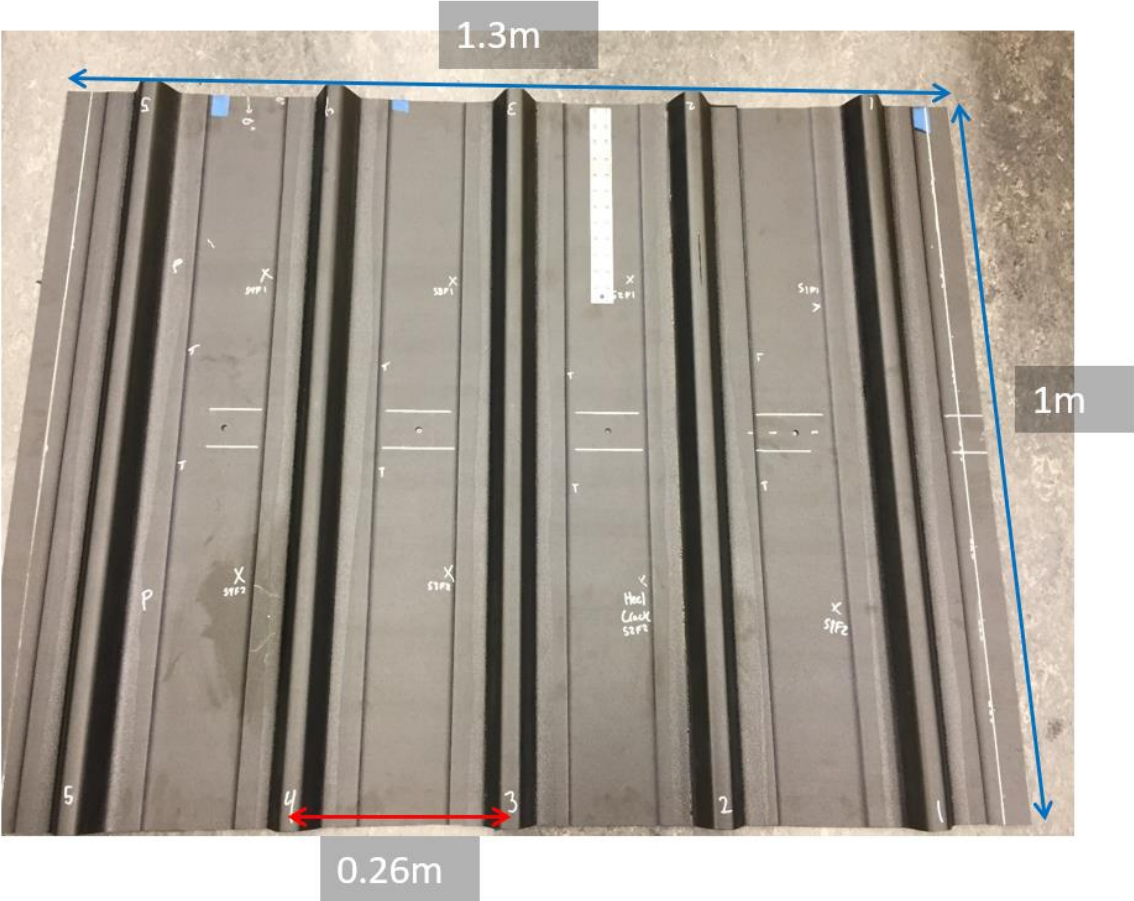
FSP2 with drilled holes at center of the panel for the pendulum impactor fixture
